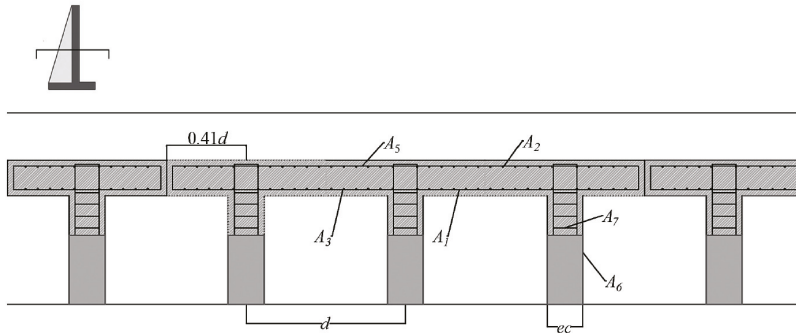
Buttressed wall. Cross-section of the floor. Source: [10].
